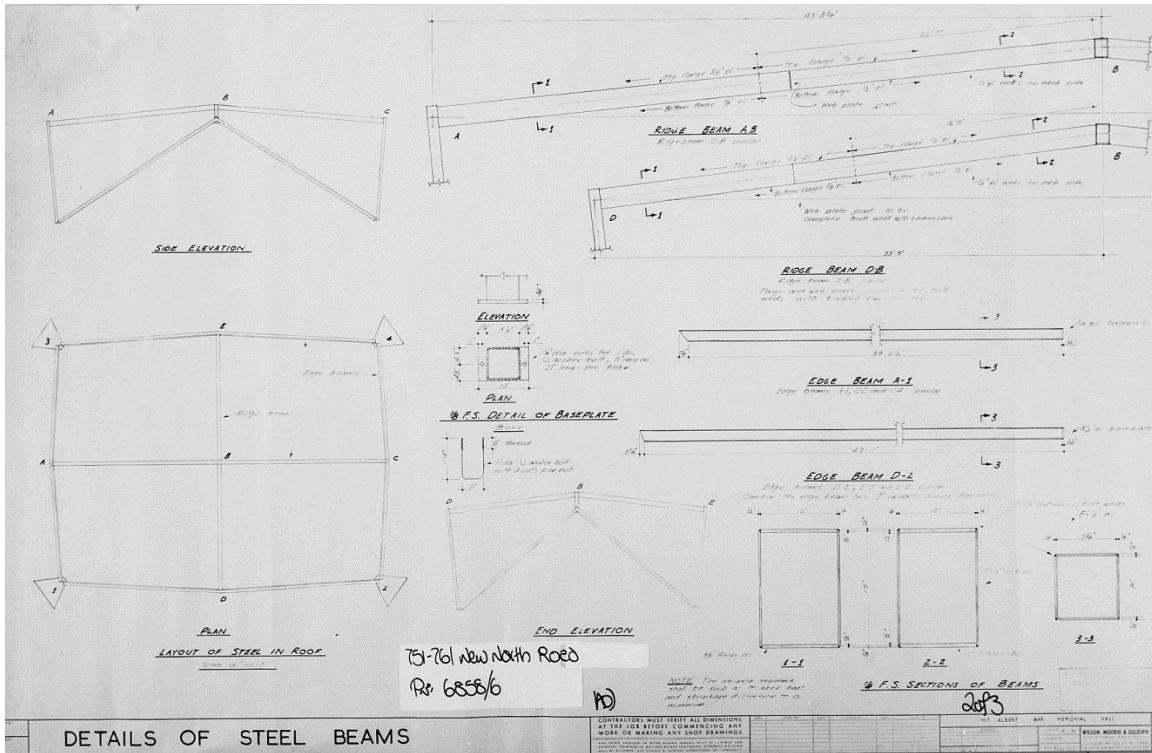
Drawings demonstrate the use of steel beams for construction of the hyperboloid roof. Auckland Council Archives microfilm, May 1960.
